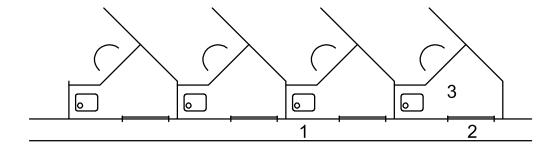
Example of a floor plan for a testing area for working in testing booths or in groups
